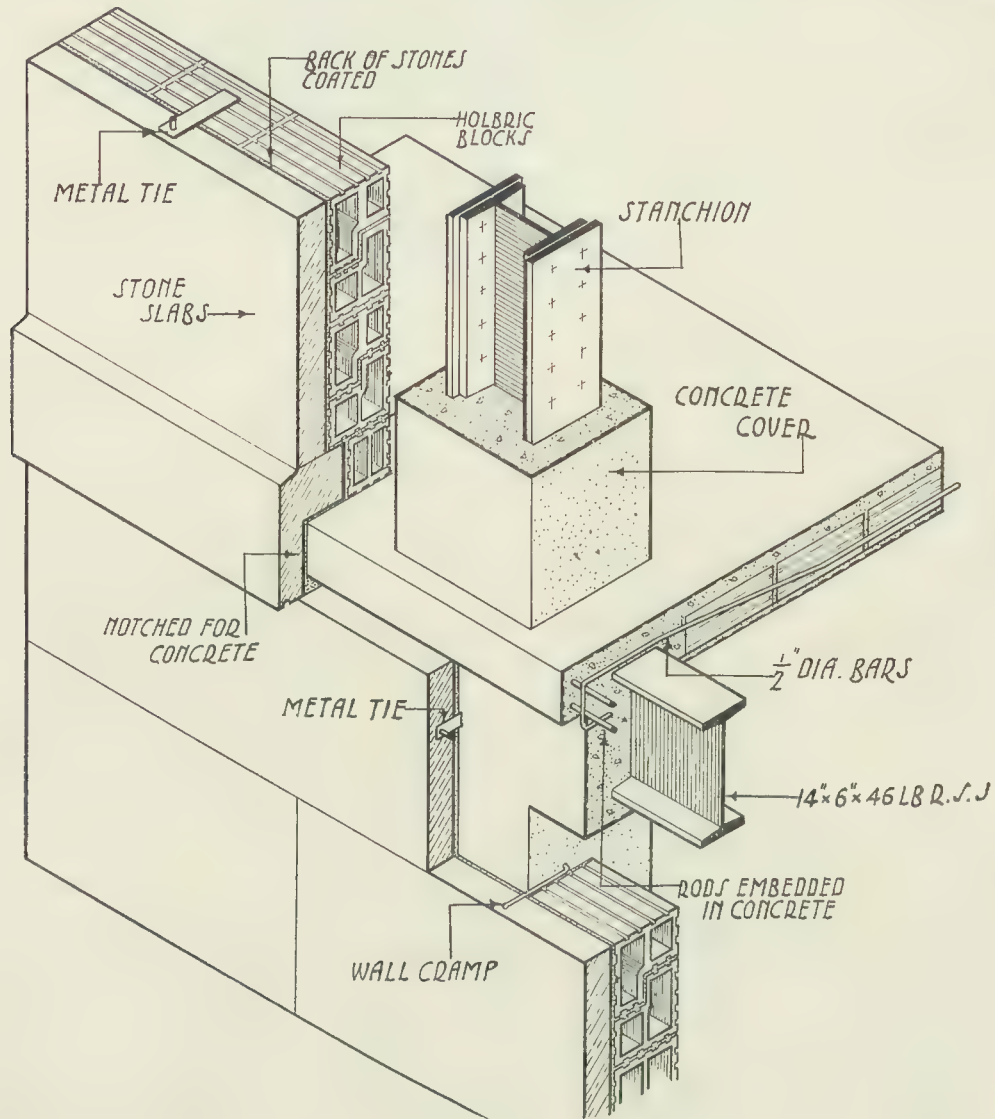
SLAB-FACED WALL WITH HOLLOW BLOCK BACKING SUPPORTED UPON CONCRETE AT FLOOR LEVEL
